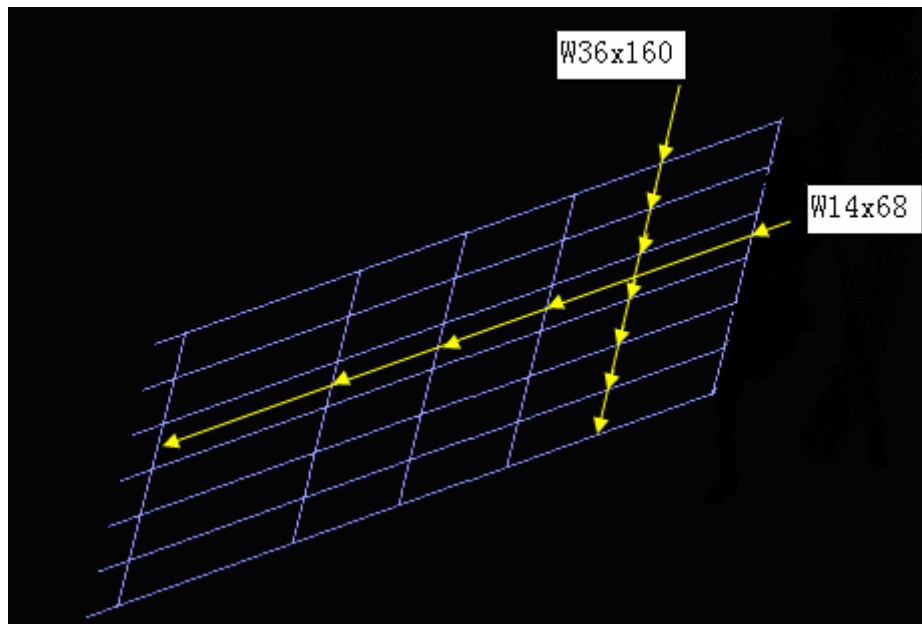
First Row Vertical and Horizontal W-Section Model.
